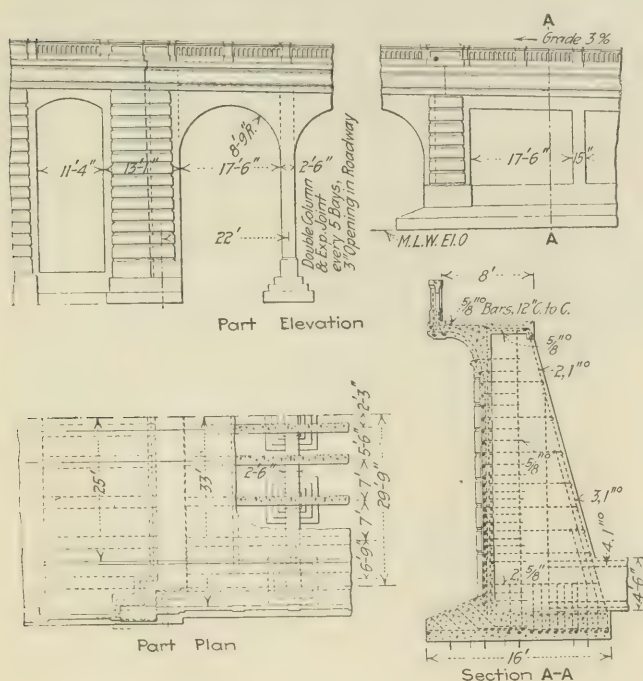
RETAINING WALL AND ARCADE DETAILS, NORTH APPROACH
